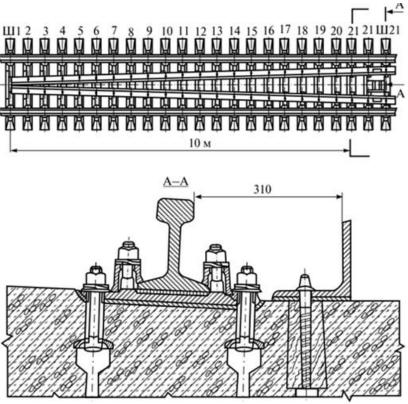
Scheme of reinforced concrete sleepers laying within 'shuttles'
